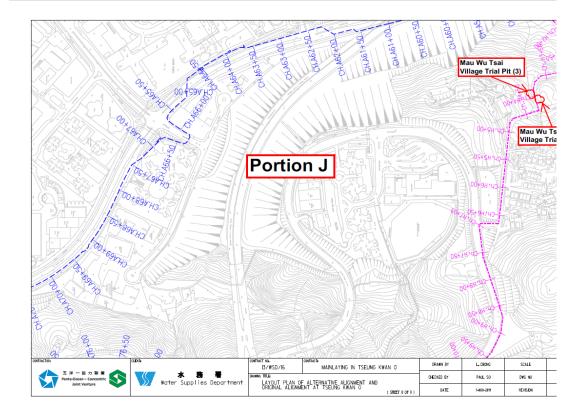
Location Plan for Mau Wu Tsai 2 & 3
